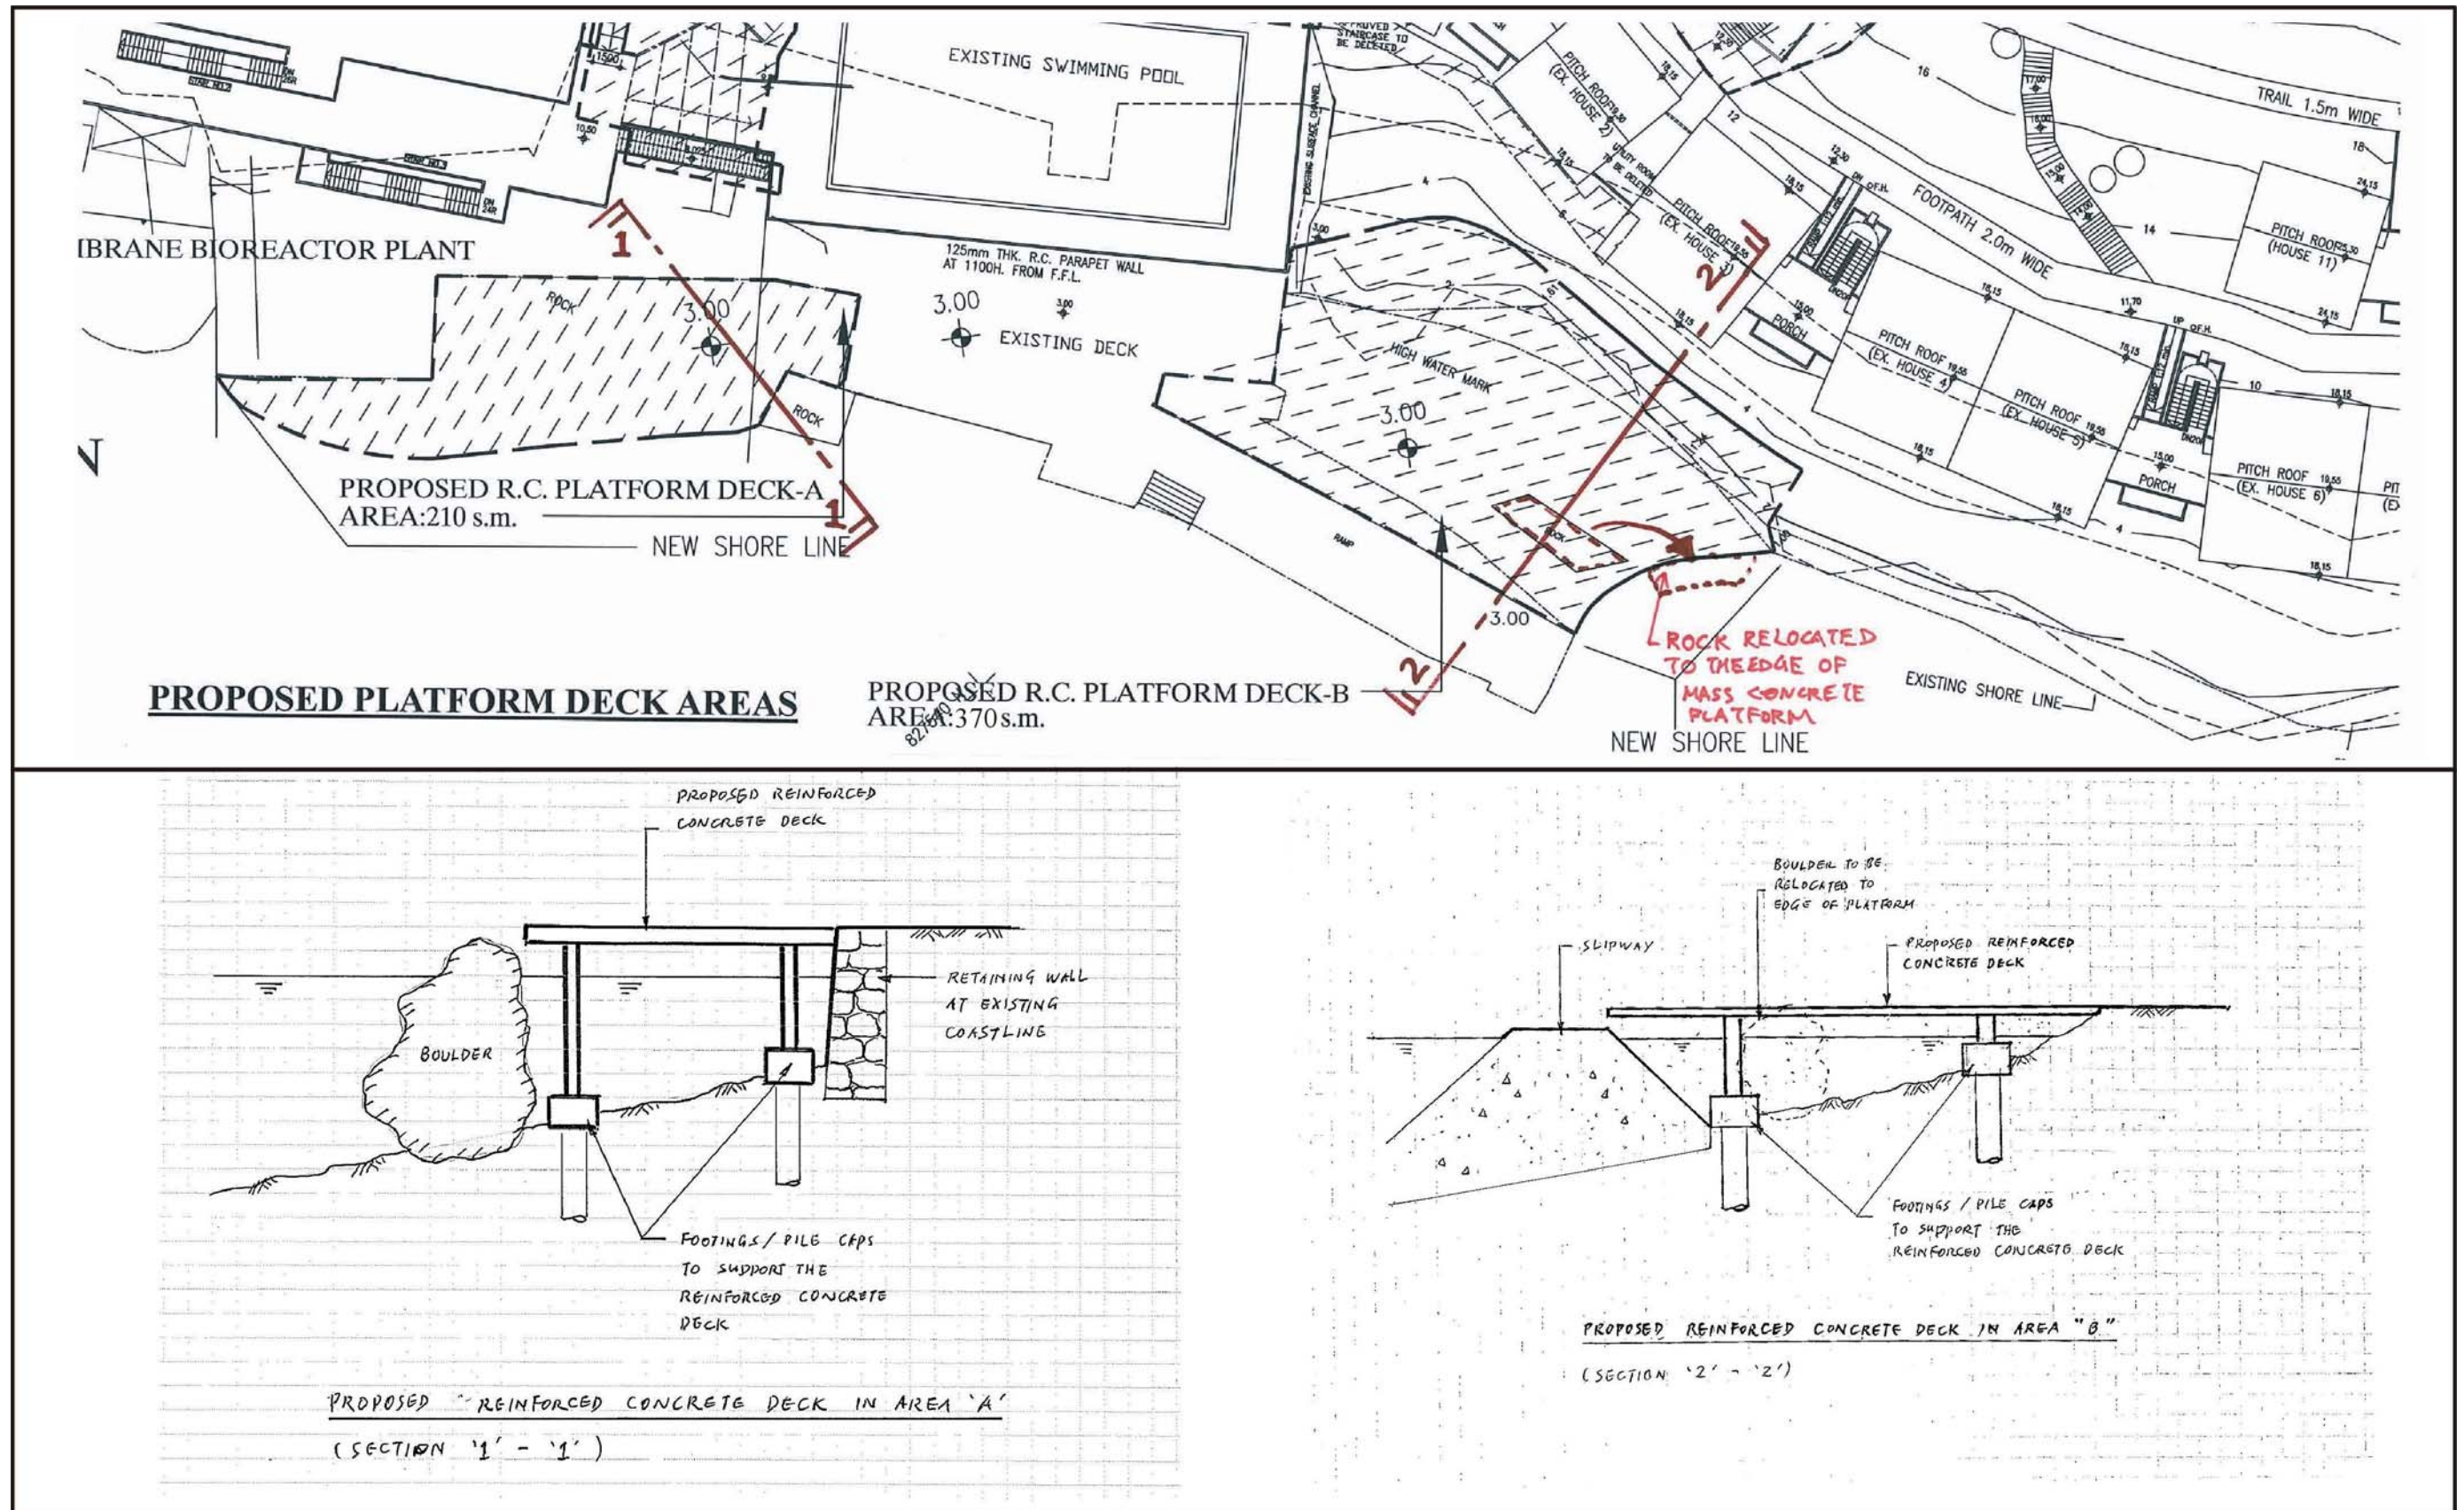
Layout of Platform Decks – Close Up and Cross Sections
